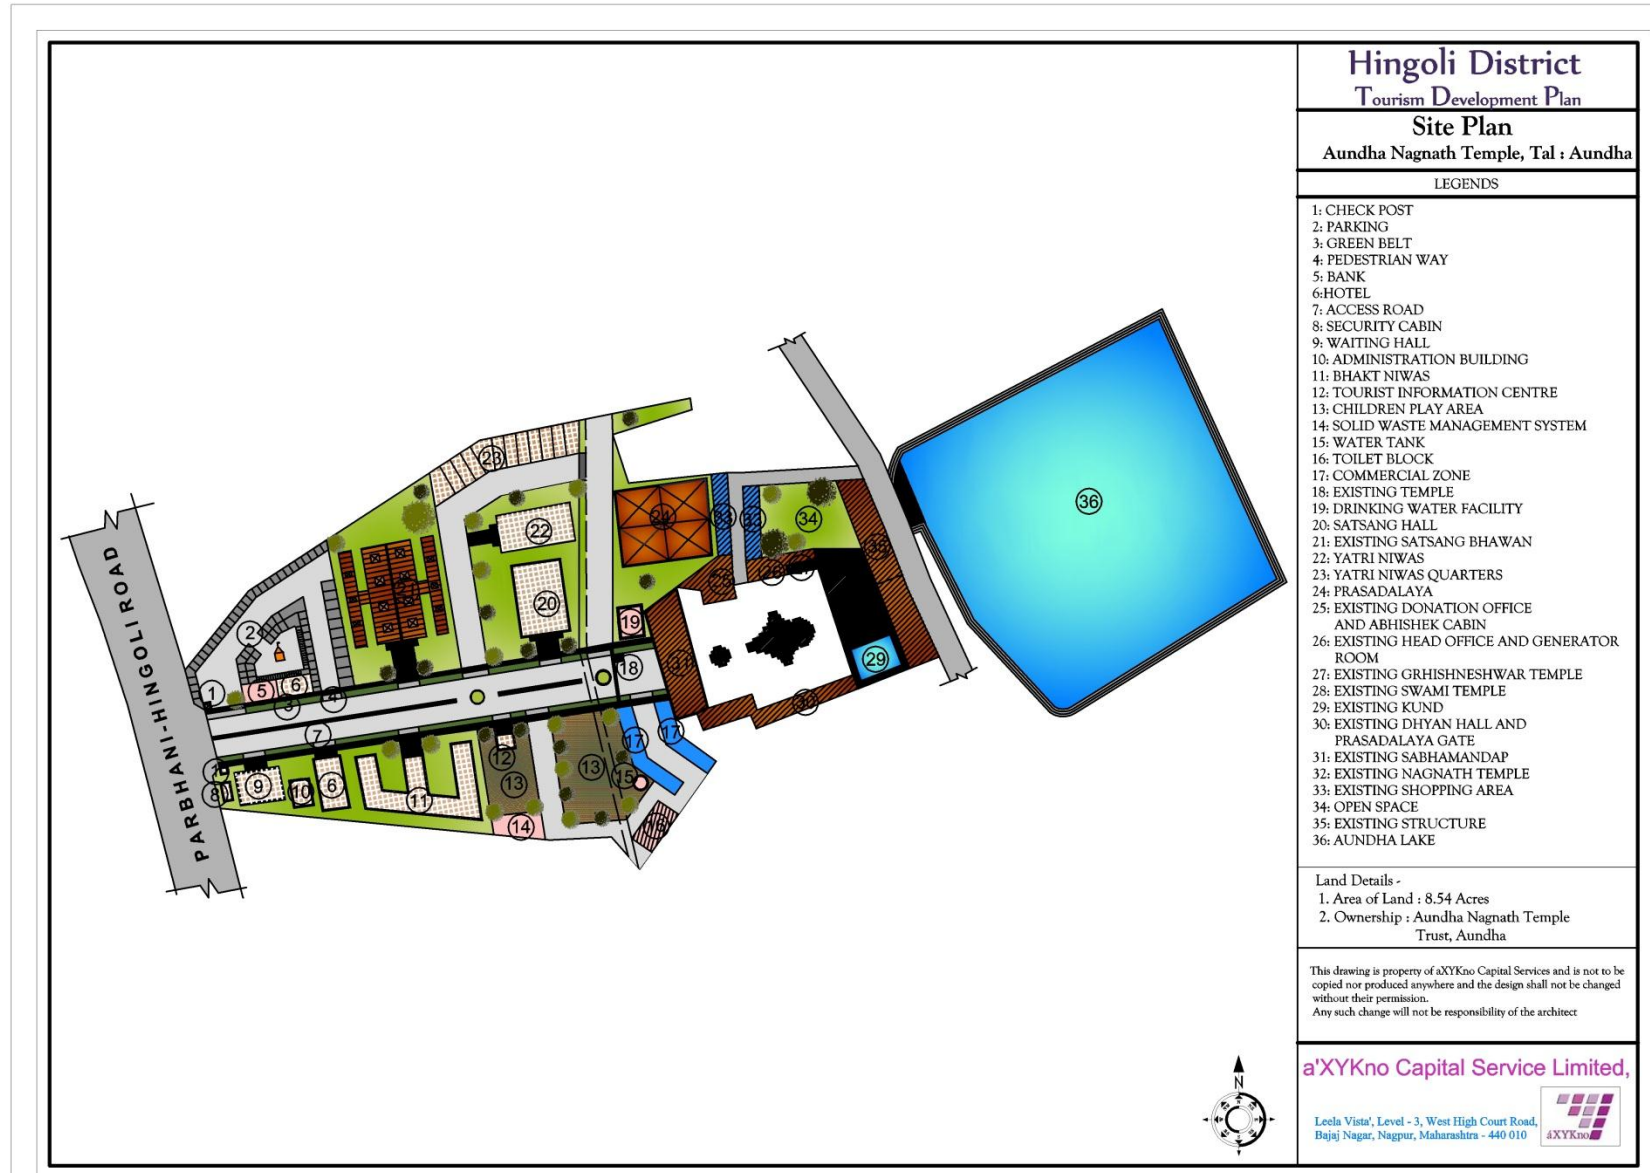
4: Site Plan – Aundha Nagnath Temple
